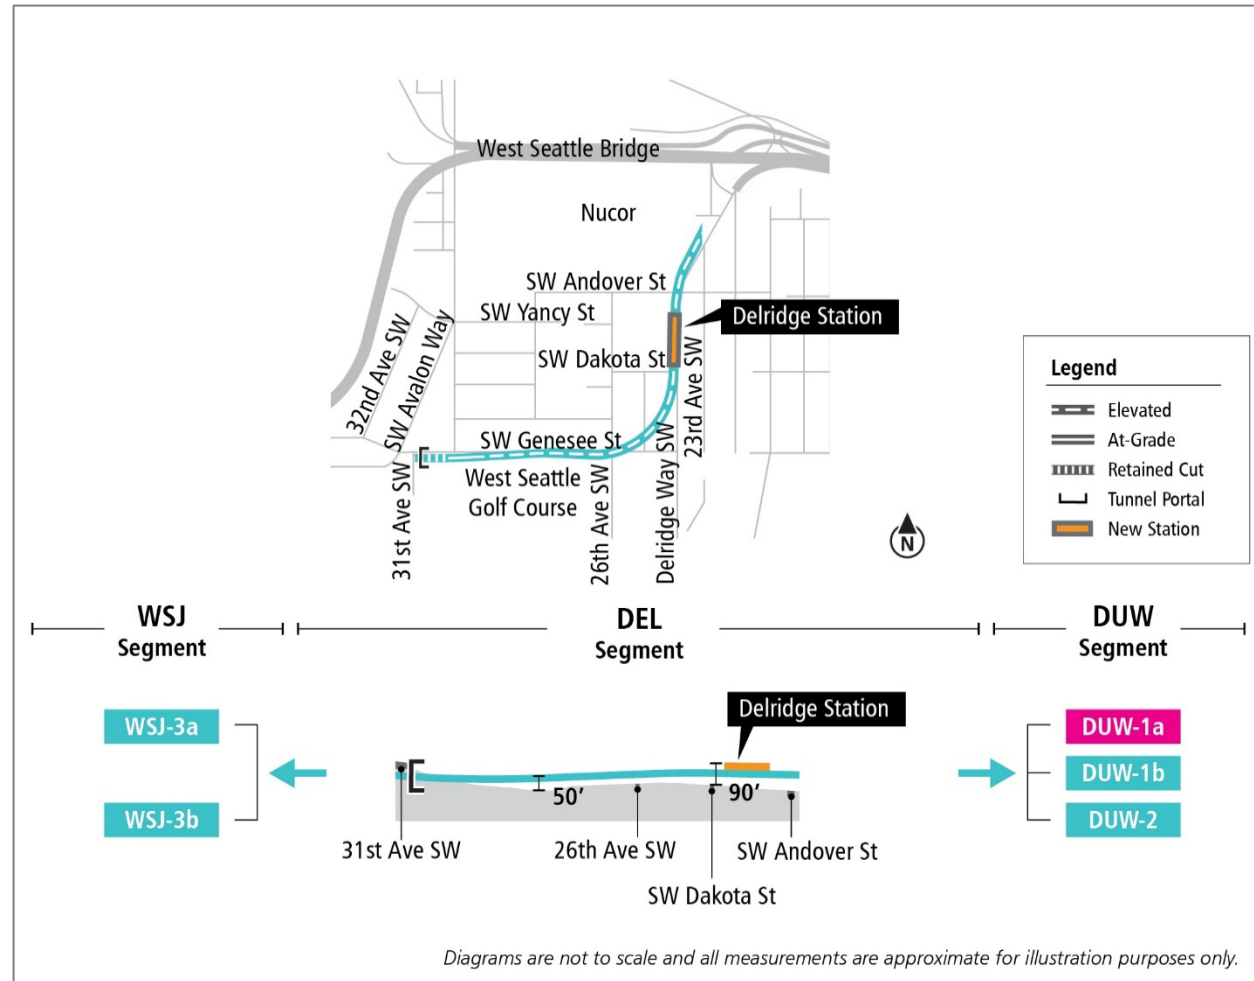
Plan and Profile for Delridge Way Station Alternative (DEL-3)
